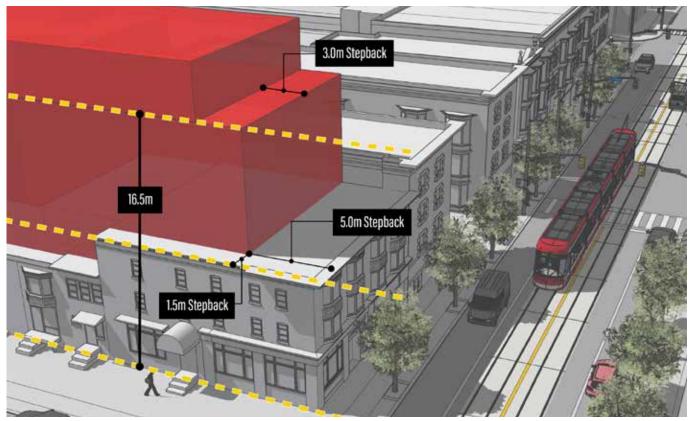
New development and additions to a contributing corner property shall provide a minimum stepback of 1.5 metres from the exposed side wall of the primary structure, and where their height exceeds a height of 16.5 metres, those portions of the uppermost storey shall provide an additional minimum stepback of 3.0 metres beyond the minimum 5.0 metre stepback.
